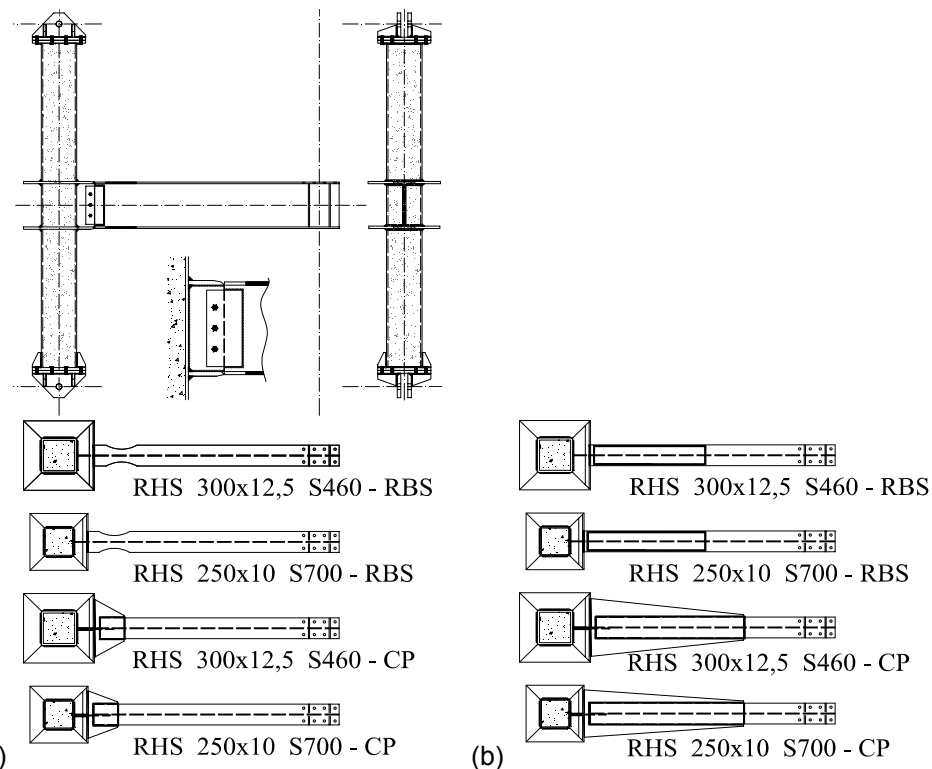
a) Configuration of the designed joint specimens, and b) the reinforced joints
